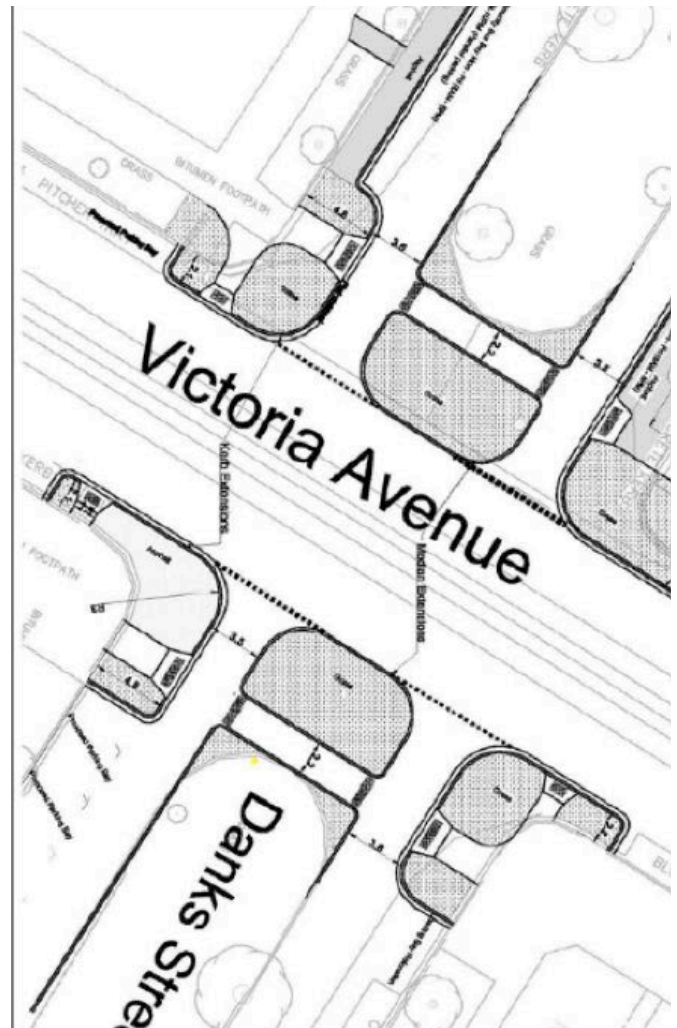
Example: Plan of Kerb Extensions and Pedestrian Refuges at Unsignalised Intersection
